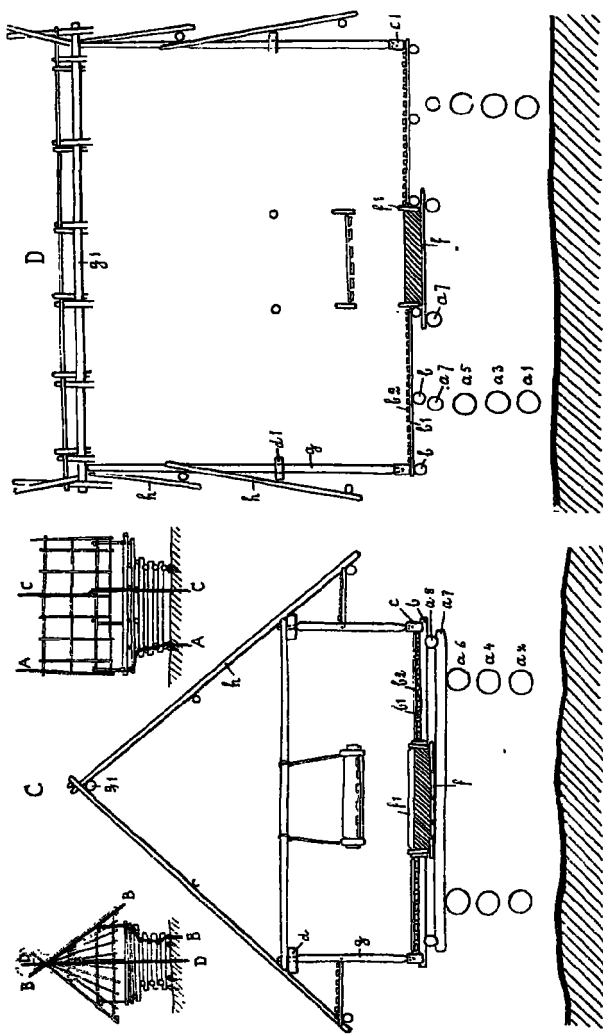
Koelawi house of type A. a¹—a⁸: foundation; b: beams of the floor; c, c': floor frame; g, g': roof truss; d: rafters.
